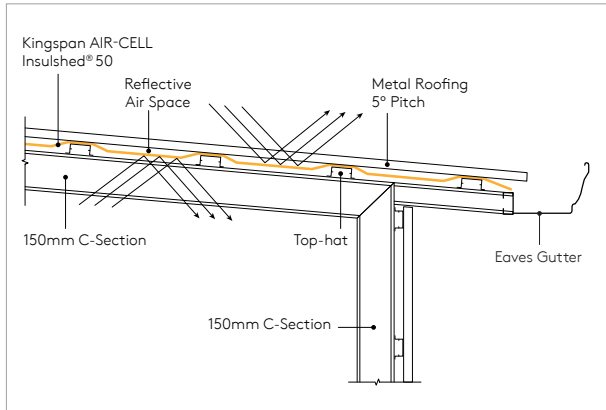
Side elevation of Kingspan AIR-CELL Insulshed® 50 in a metal roof shed.
